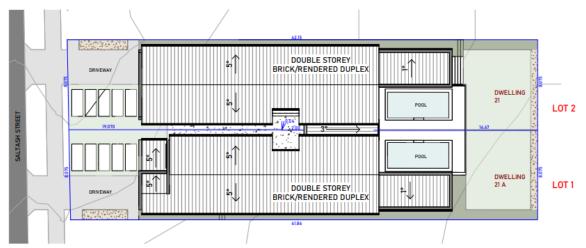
Proposed modified Site Plan showing slight amendments to the roof of the development.
